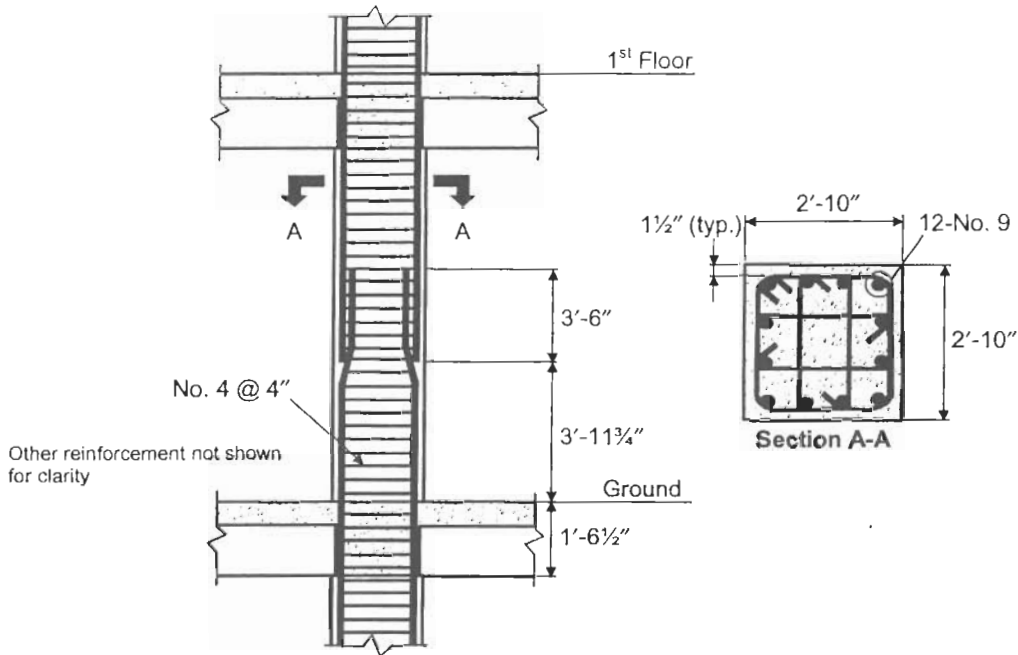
Reinforcement Details for Column C3 Supporting the 1<sup>st</sup> Floor Level (SDC D)
